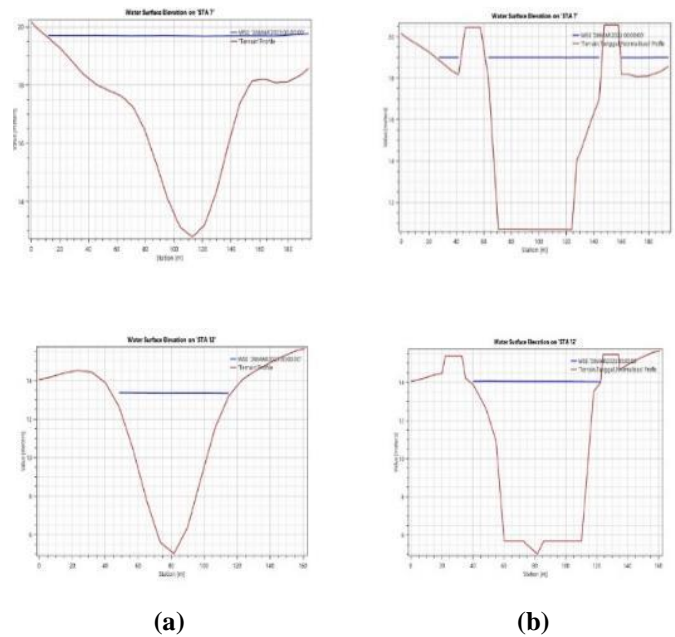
Comparison of Cross Section (a) existing condition (b) after retaining wall construction
